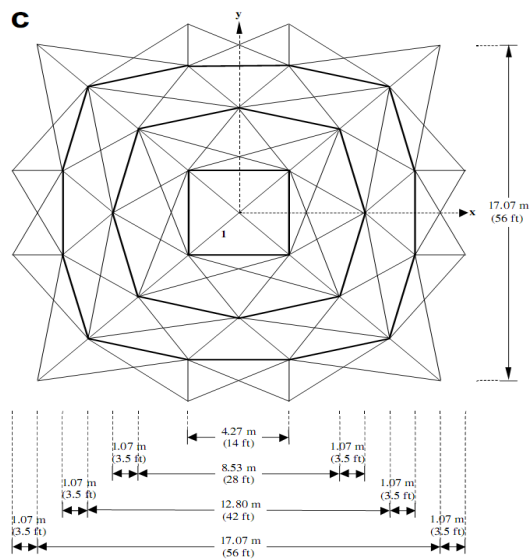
The 26-Story, 942-bar space truss tower: (c) Top view
